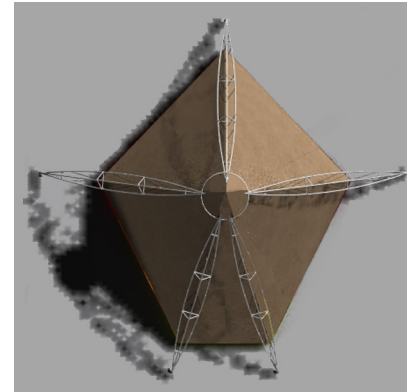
Winter configuration roof plan requires five completed poles (above).
